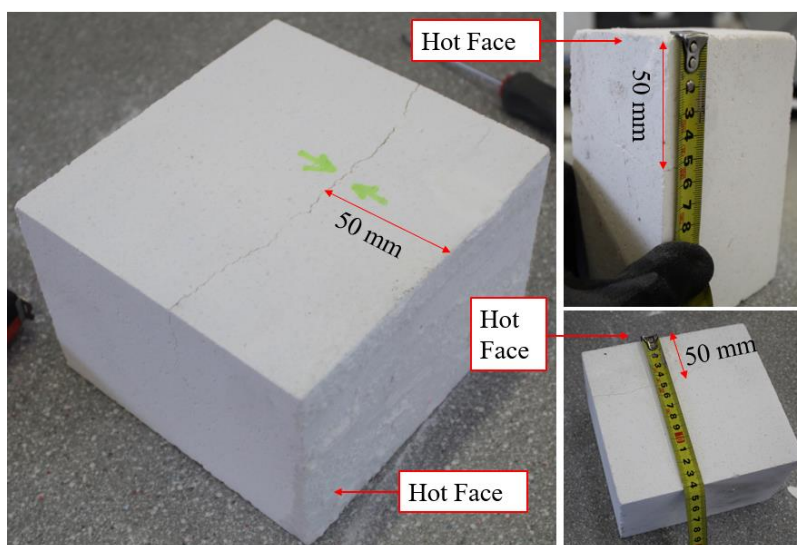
Test series S09.HT.CBJ – Cracks 50 mm away from the hot face
